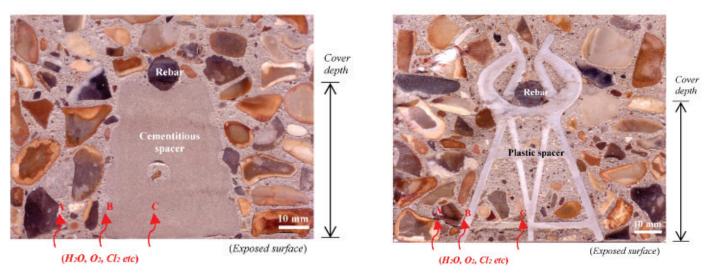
Cross-section of reinforced concrete with cementitious block spacer and clip-on/off spacer (Source: Alzyoud et al., 2016)
